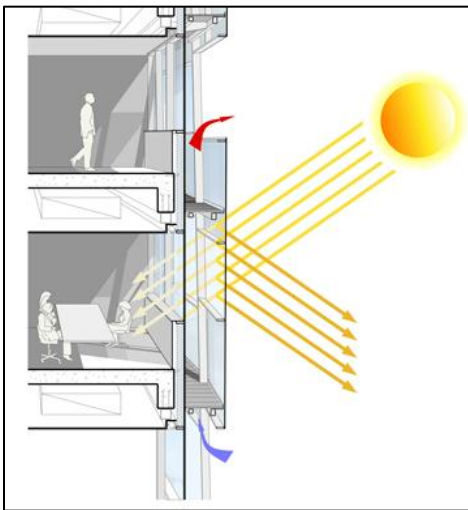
Glass Sunshade Wall Double Layer Detail (Image courtesy of Ennead Architects)
